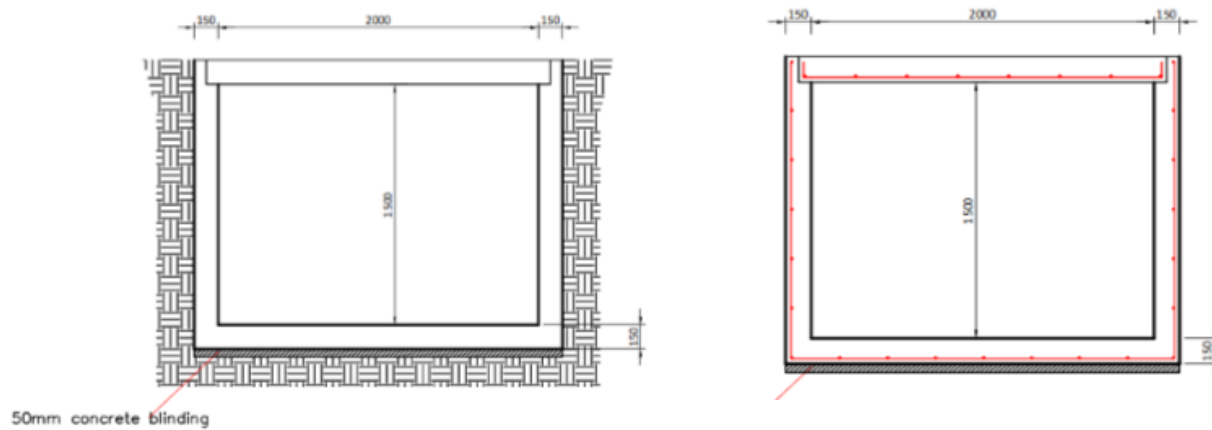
Typical section of diversion channel (Iguosa FHA Engineering Design, December 2019)
